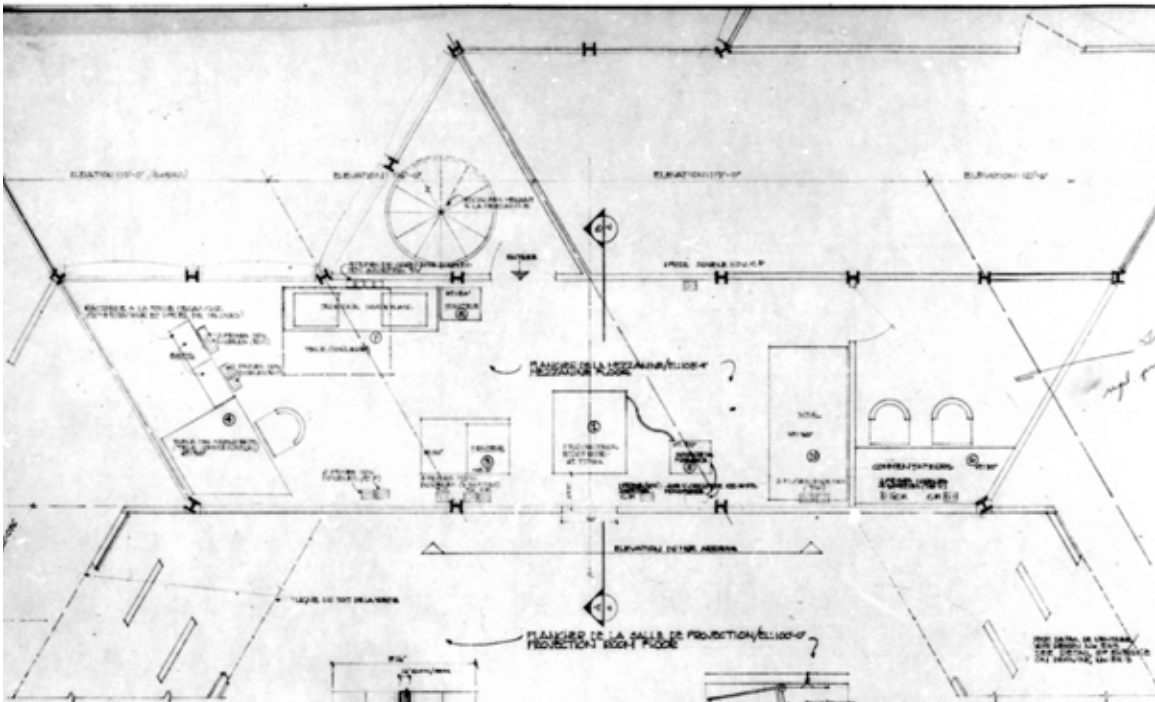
Floor plan of the technical room (mezzanine) in the Québec Industries pavilion.
